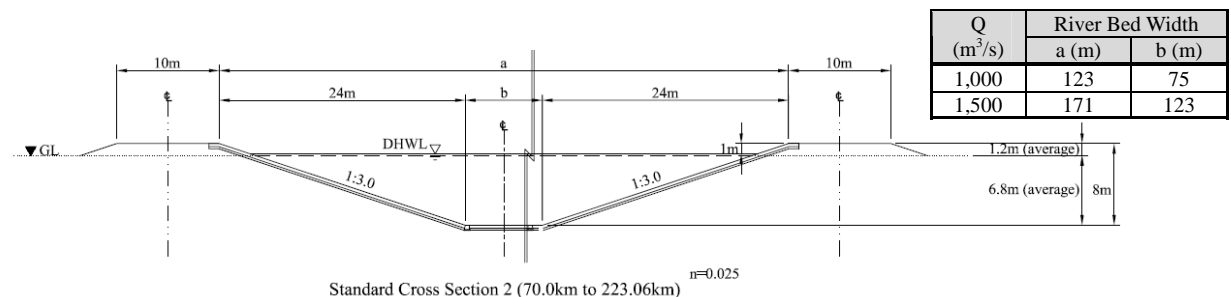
Alternative Cross Section of West Diversion Channel with Slope and Riverbed Protection (70.0km to Diversion Point)
